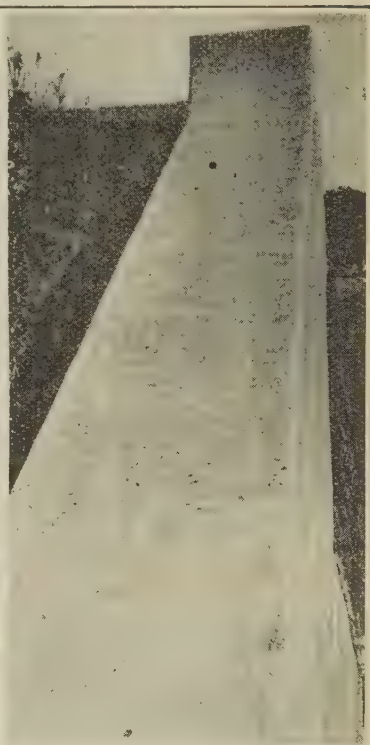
A WING WALL COPING AFTER 10 YEARS OF ABOUT THE SAME EXPOSURE AS THE WALL IN FIG. 19.
